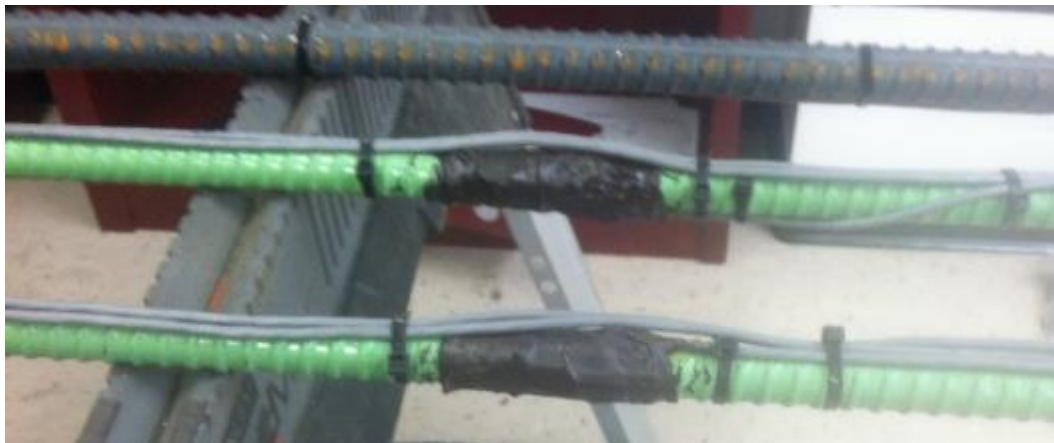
Double Coating to Protect the Strain Gauges and Wiring.
